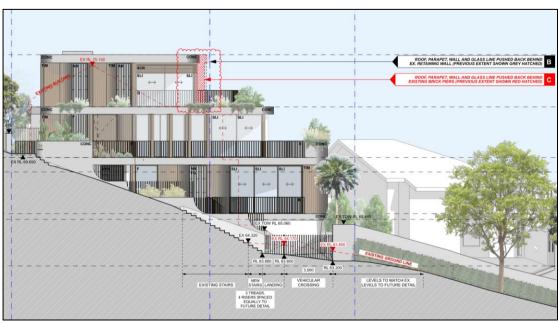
Extract of proposed street elevation of DA/562/2021 (Source: MHNDUnion)
